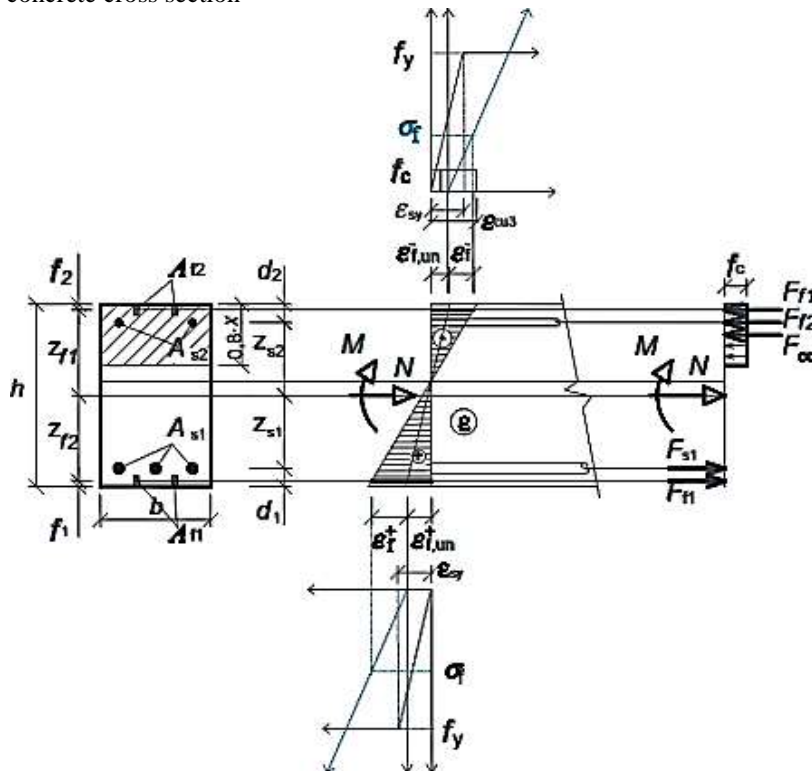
Forces in cross section strengthened with longitudinal CFRP strips
